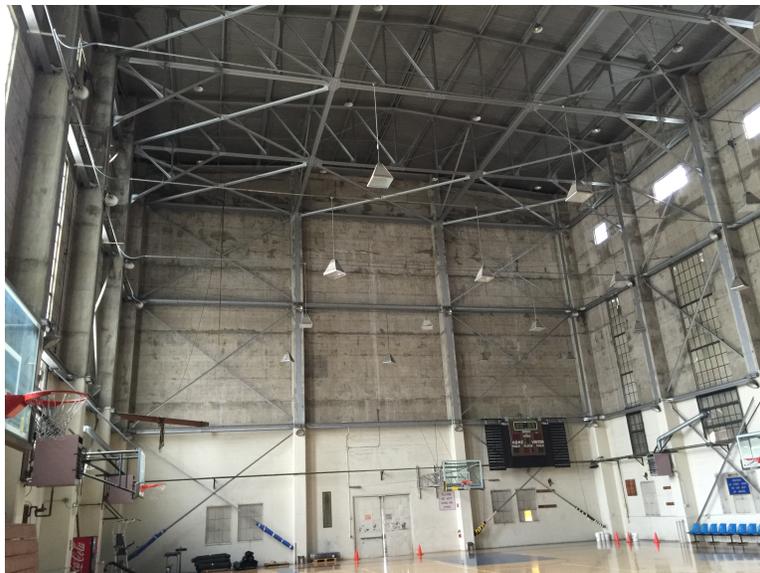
Building 2 interior; south wall with exposed bracing and trusses.
